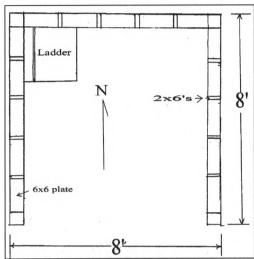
Tower floor plan sketch, with hatch, attached ladder, and wall framing details (plan drawing by Floyd Soenksen)
